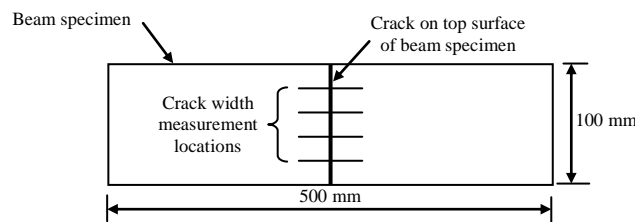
Plan of beam specimen showing crack width measurement locations
